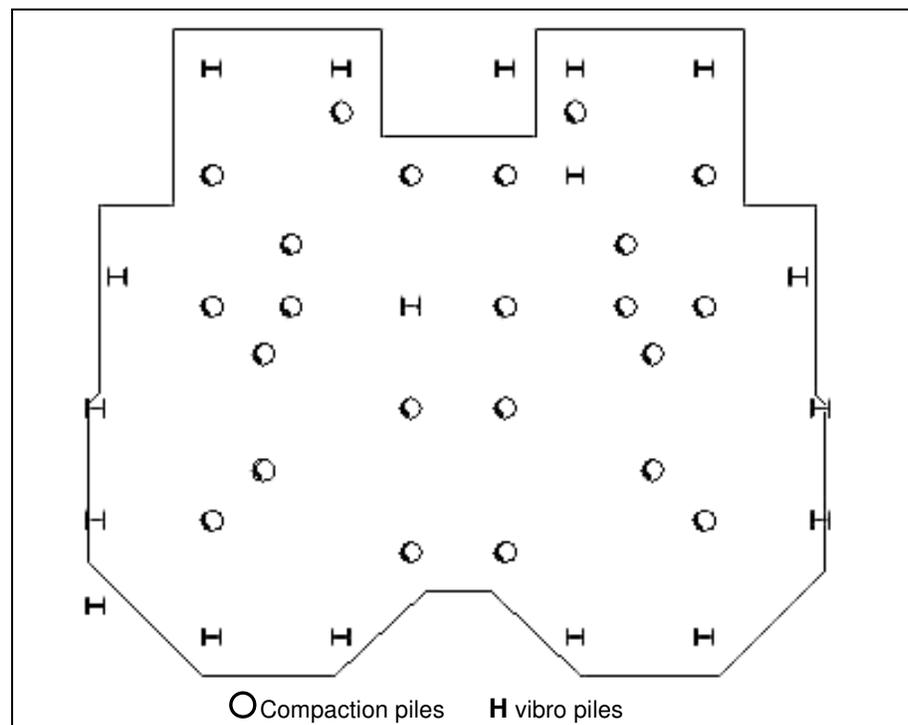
Plan of vibro and compaction piles locations for Afsoon building project.
